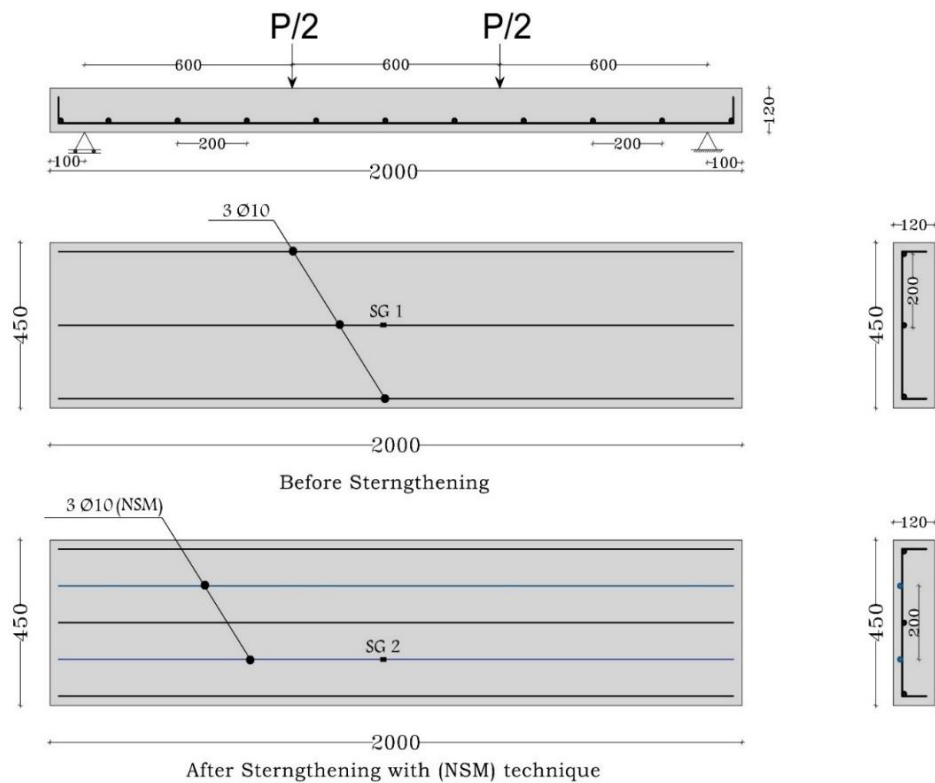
Details of reinforcement of tested slabs before and after strengthening
